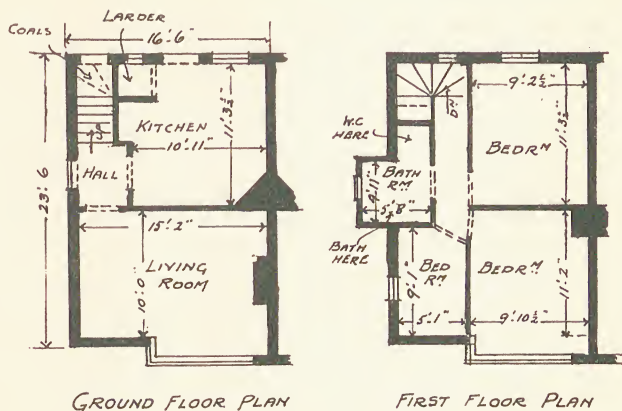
ALTERNATIVE PLAN FOR A SMALLER HOUSE
